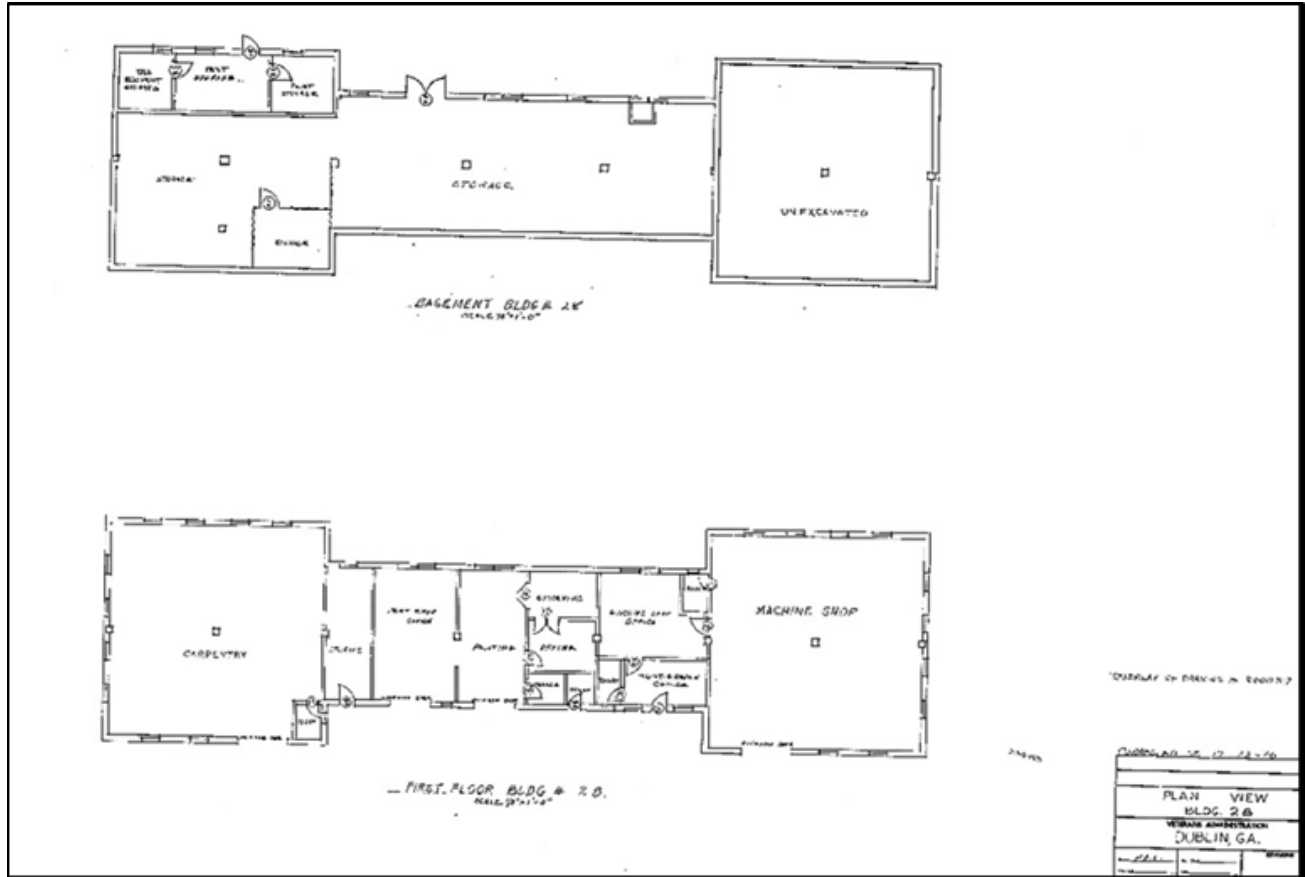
Architectural drawing showing the I-shaped plan of Building No. 28 (VA).
